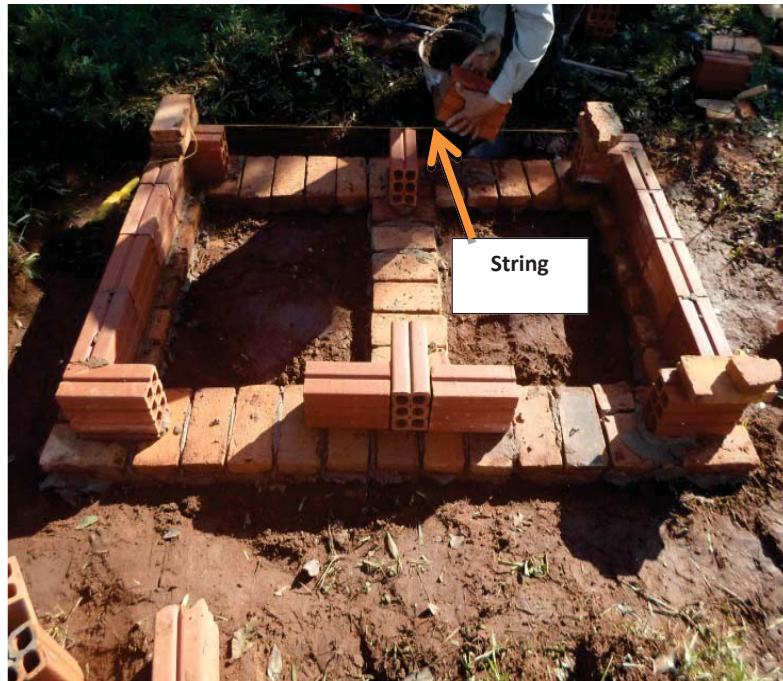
String strung between corner bricks to aid in the laying of brick layer. Photo by author.
